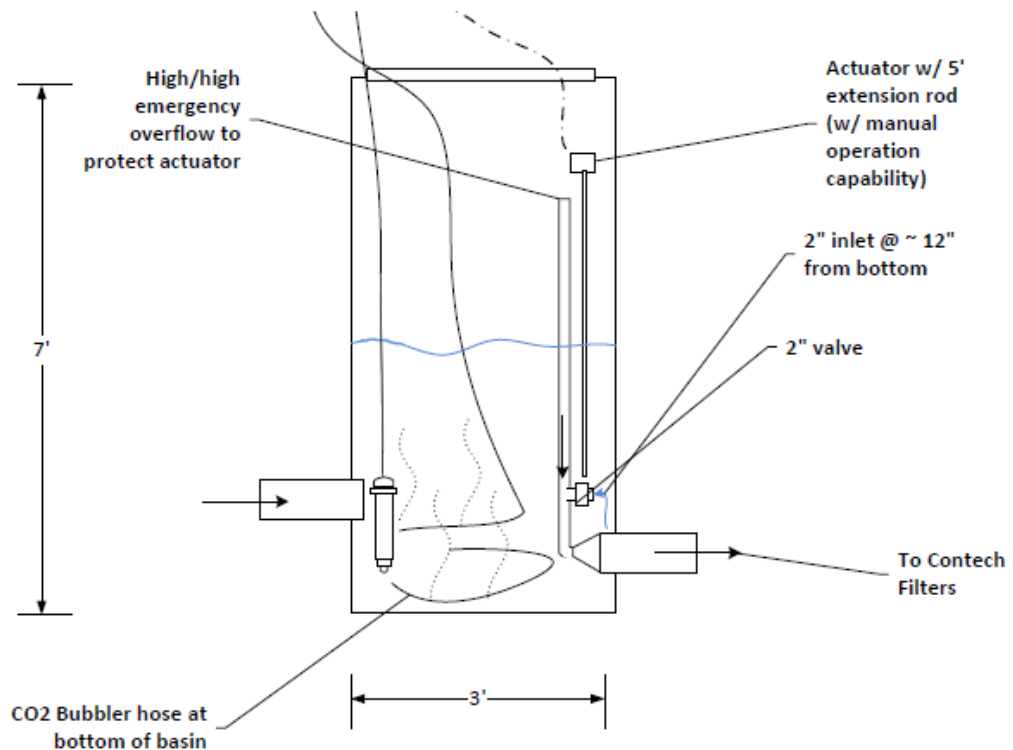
Basin showing pH probe, bubbler tube and discharge valve
